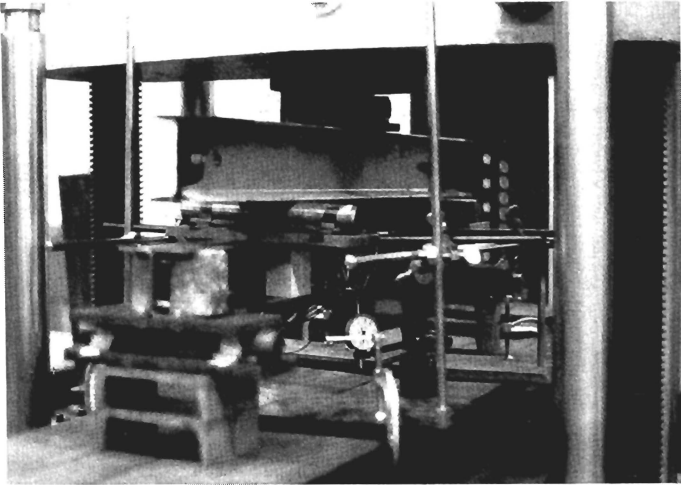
Photo of Test Setup for I-Beams with Unstiffened Flanges
